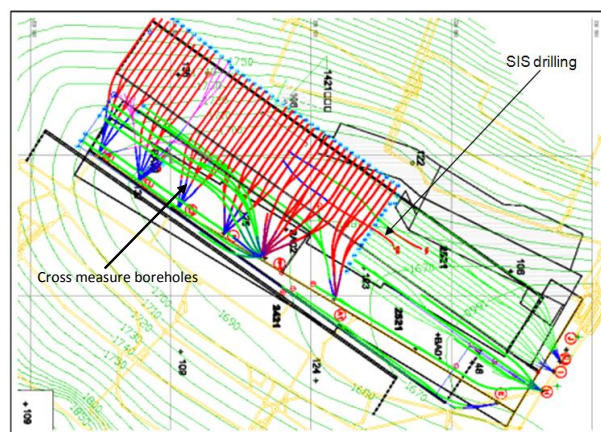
Baijogou gas drainage layout (Hungerford, 2008)
